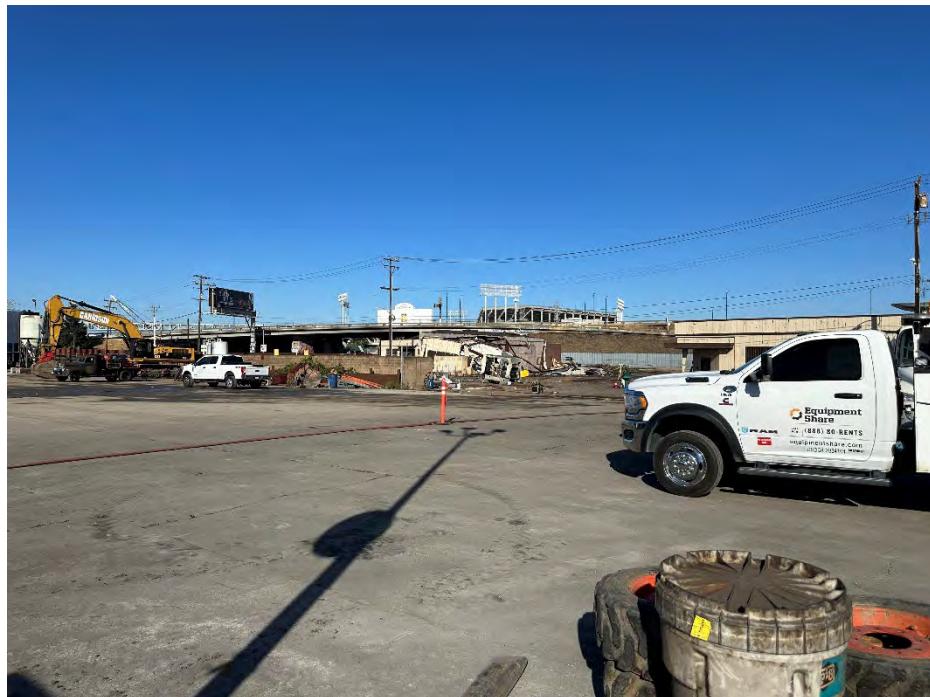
Facing southwest, loading trucks with debris from the Main Facility Demo.
